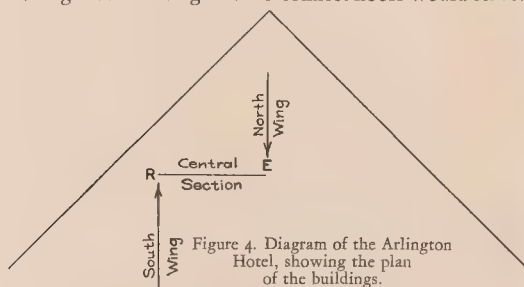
Diagram of the Arlington Hotel, showing the plan of the buildings.
